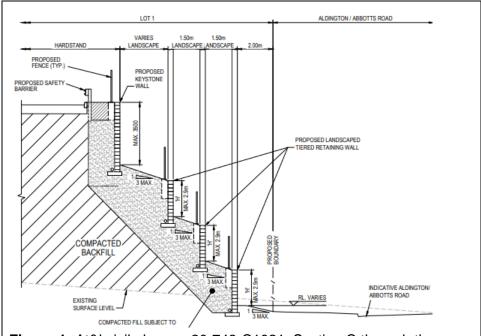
At&l civil plan no. 20-748-C1021, Section C through the frontage of the site to Aldington Road.
